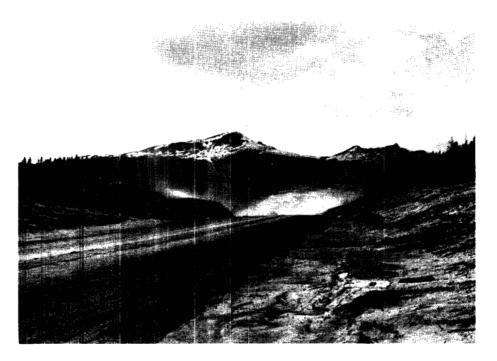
Steep, sandy-silt backslopes in approach to Seagull Creek. Alaska Highway, km 1180. Reconstructed section.
